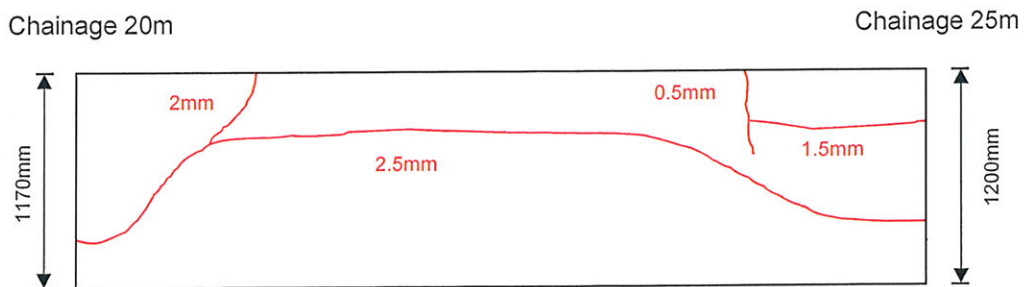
Wall Height, Crack Locations and Sizes for Chainages 20m to 25m
